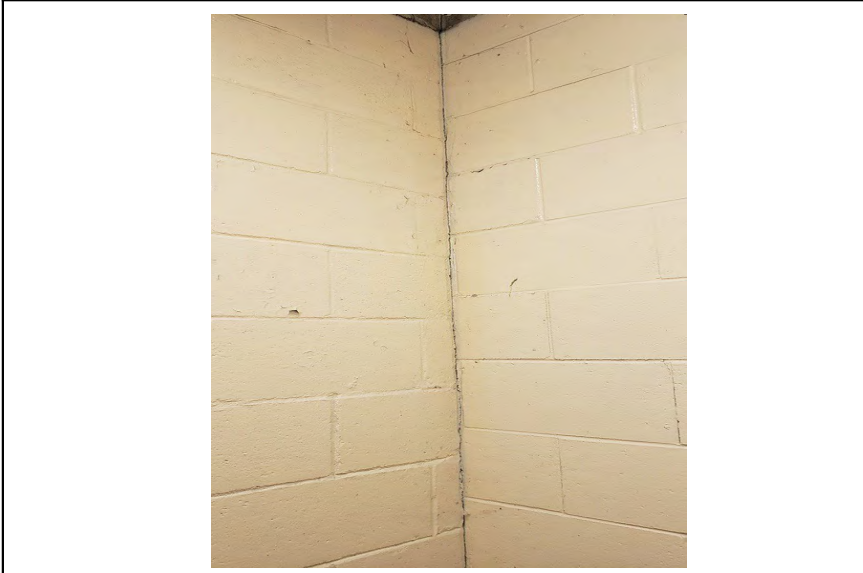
Mortar Joint Cracking in West-Side Stairwell
